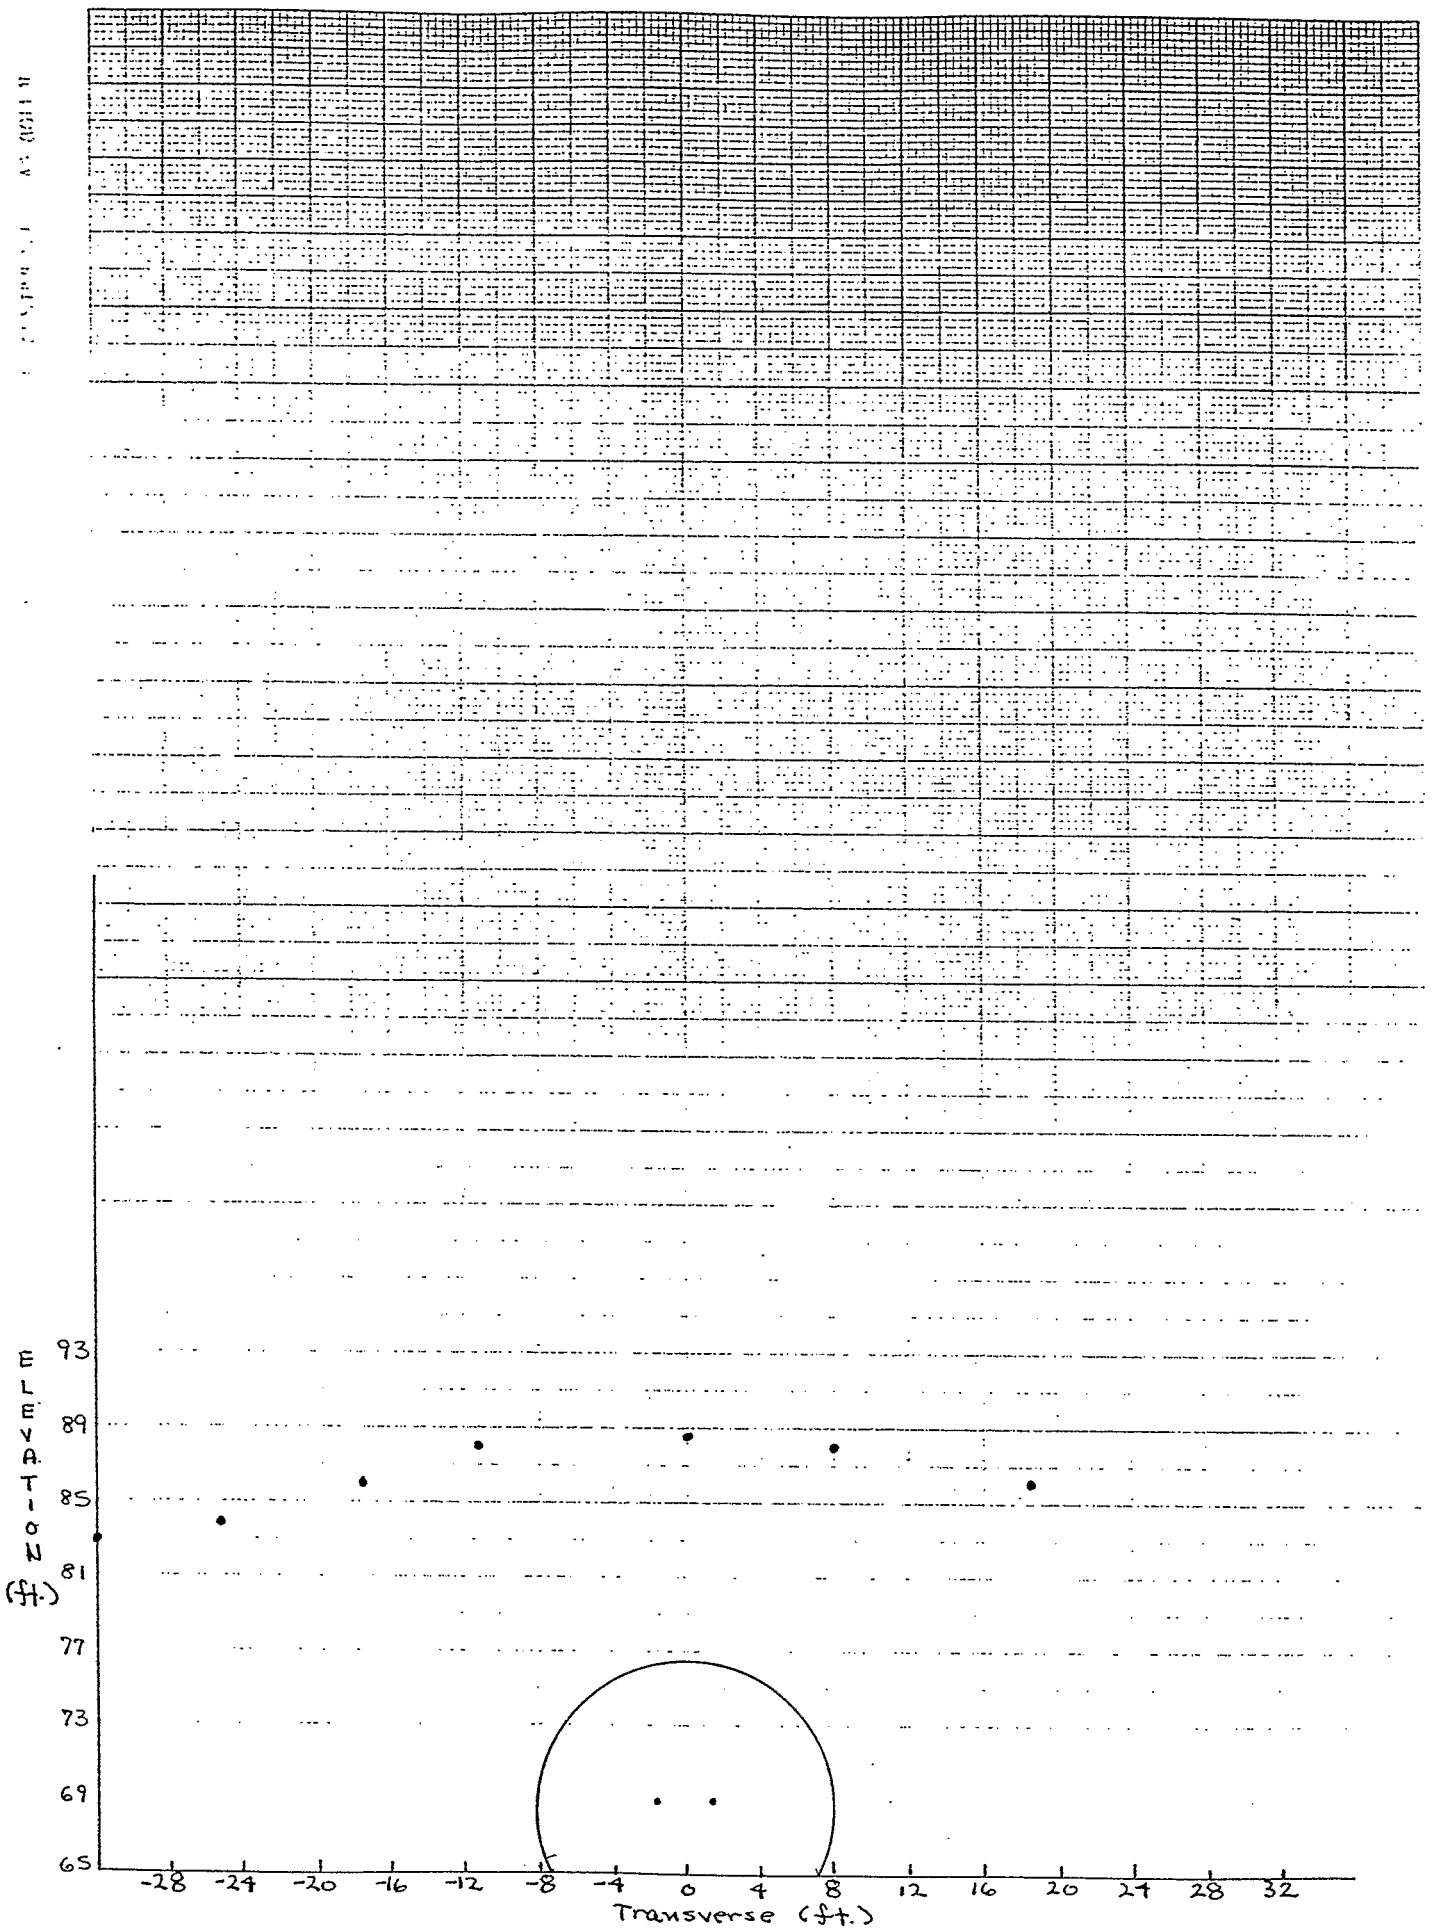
Typical Cross Section South of the Collimator at 8 o'clock (Counter-clockwise Beam)
